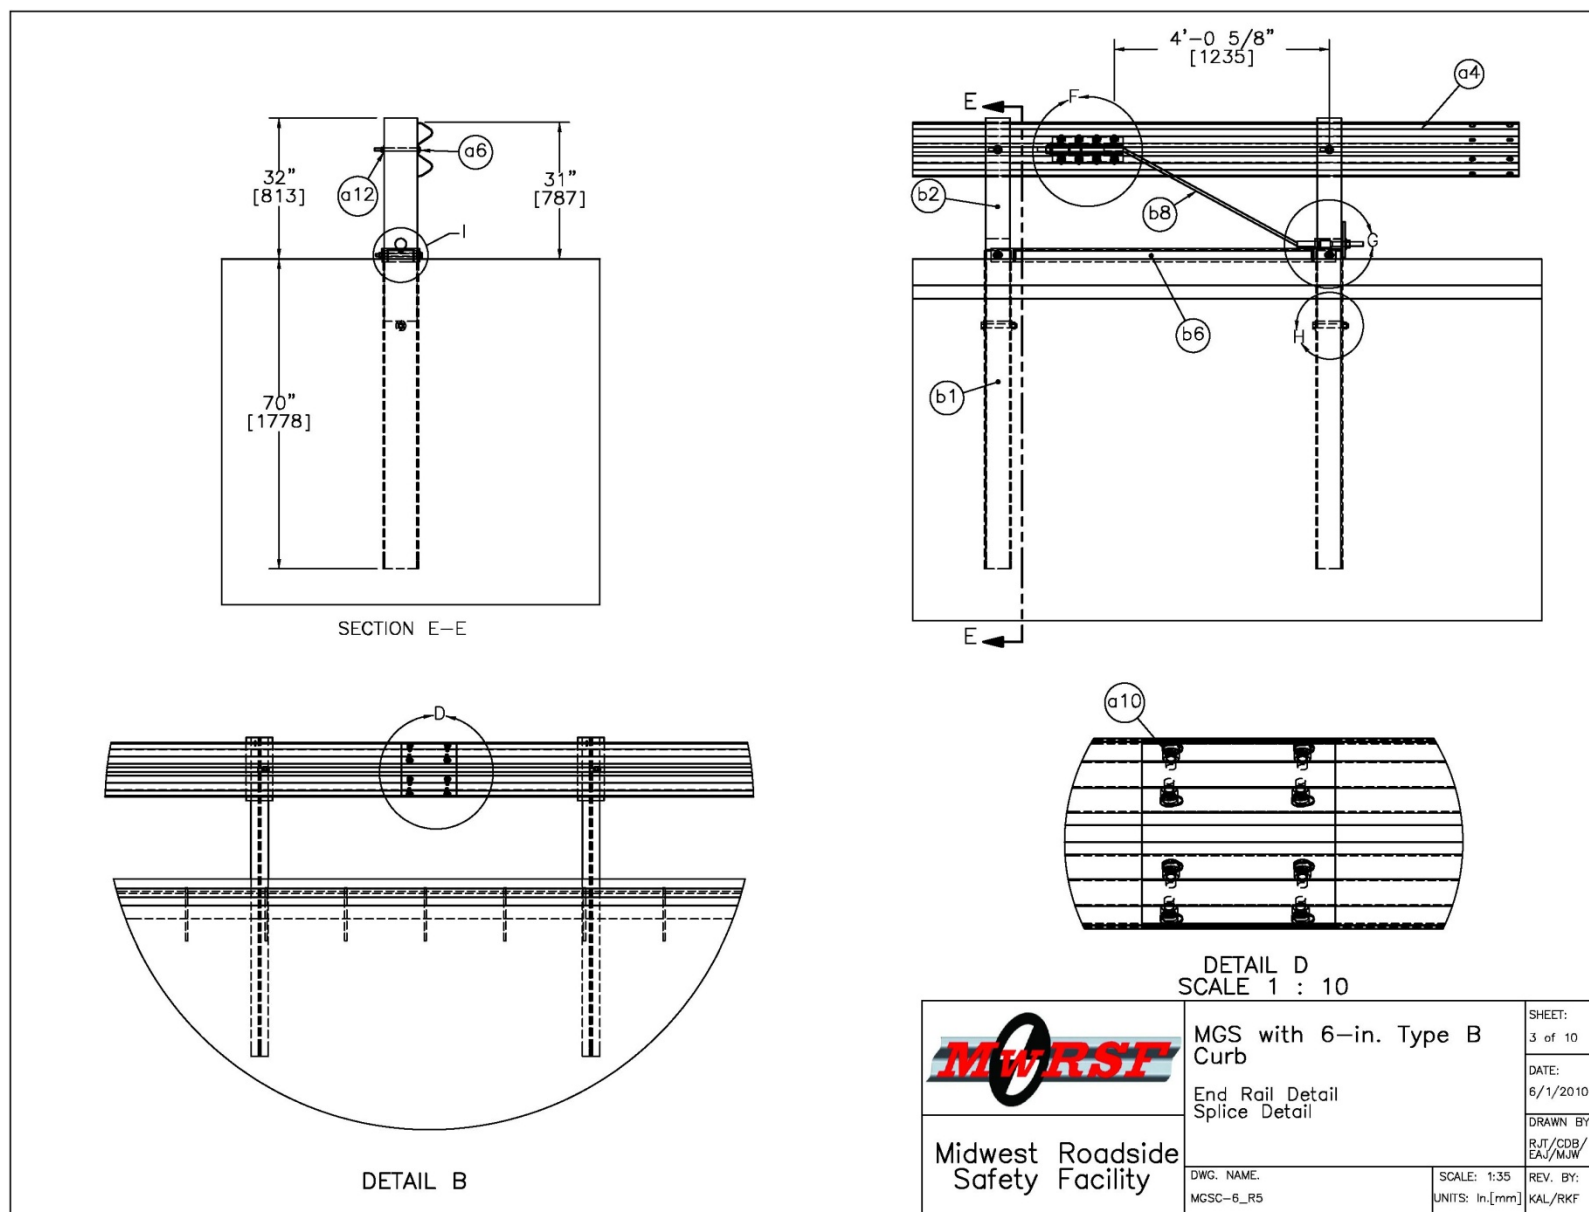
End Rail and Splice Details, Test No. MGSC-6
